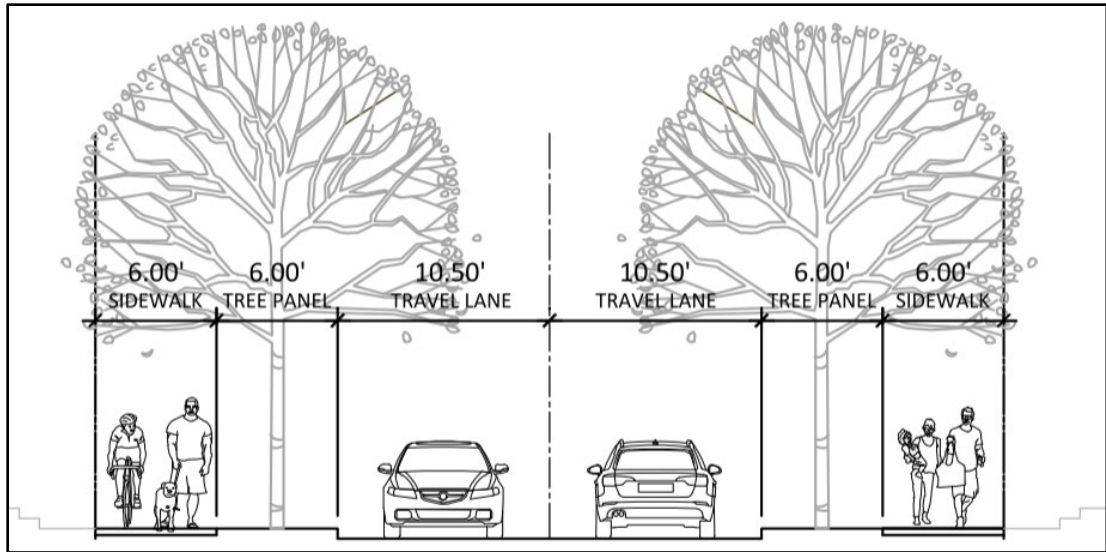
Proposed Cross-Section for Street C, as conditioned.
